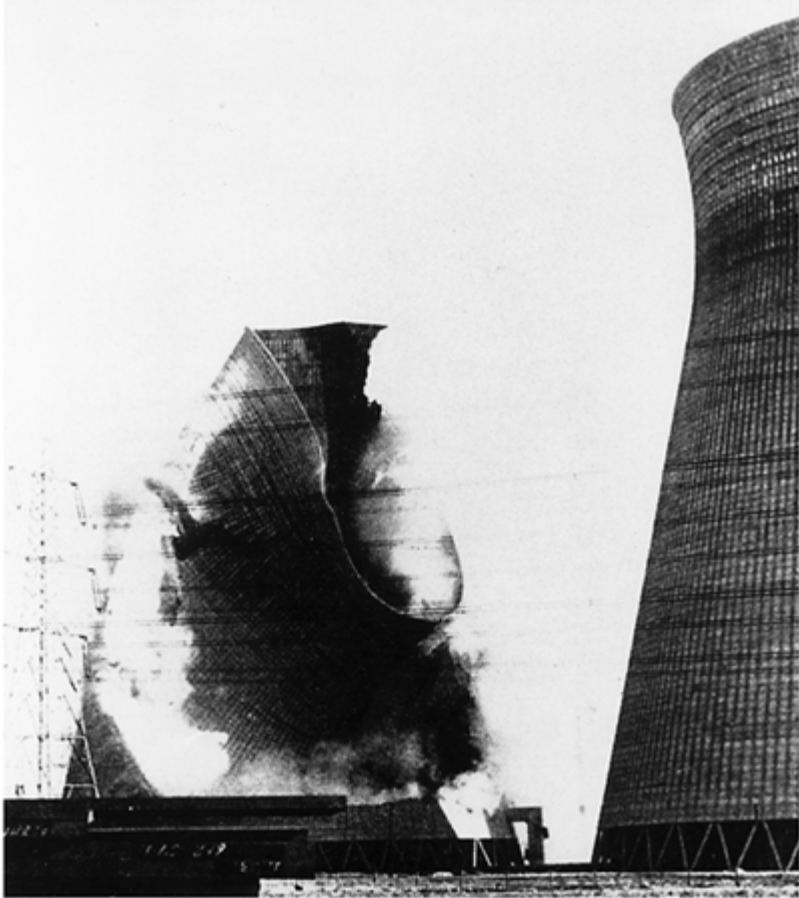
Ferrybridge Cooling Tower failures, 1965.
